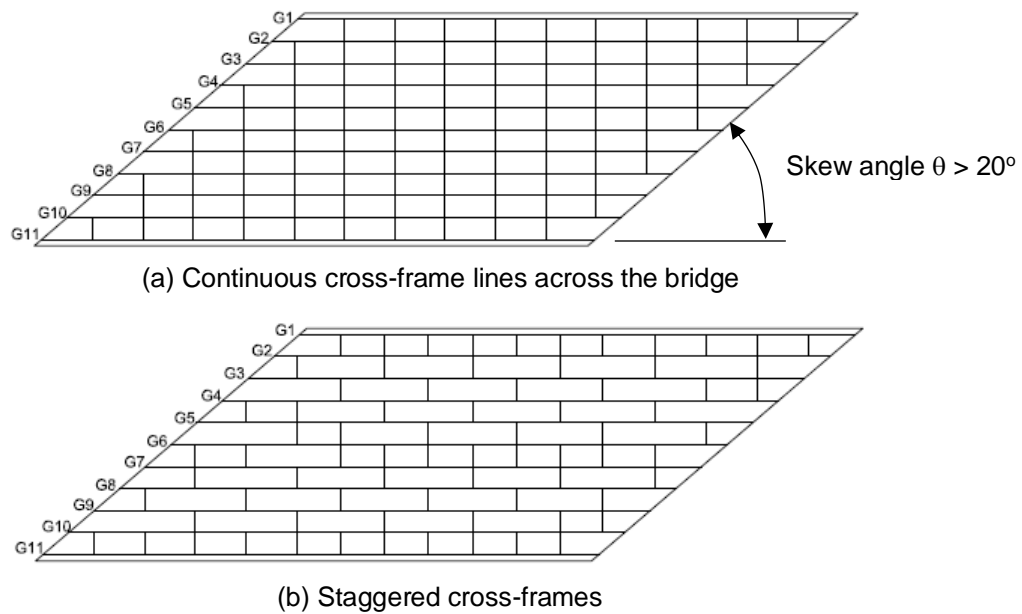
Use of staggered cross frames to reduce the forces attracted to the cross-frame members in skewed I-girder bridges.
